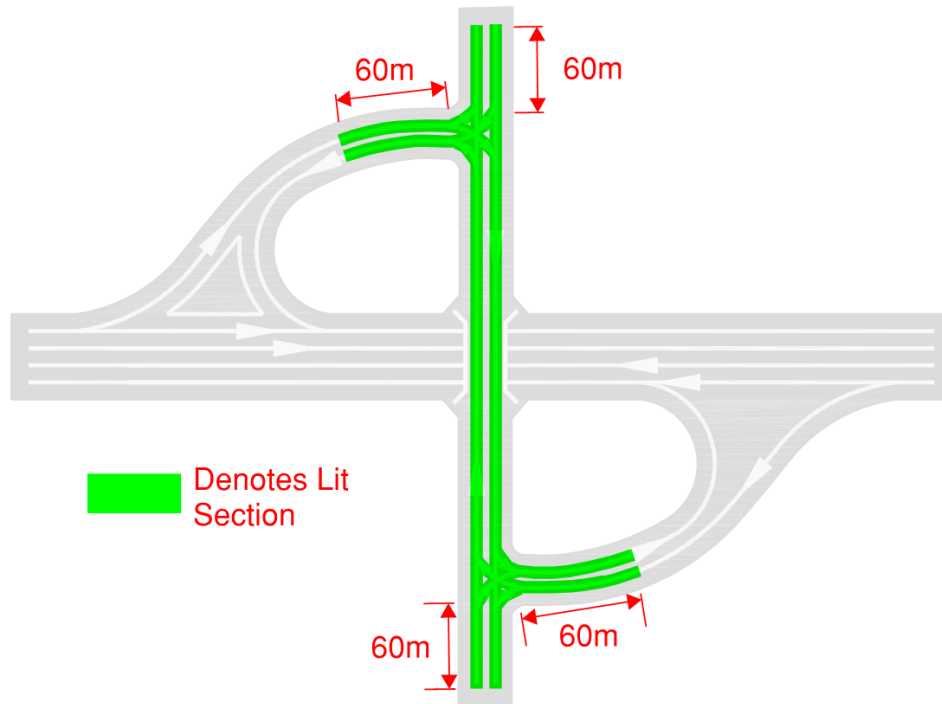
Lighting Extents for a Typical Layouts of a Half Cloverleaf Quadrant 1 and 3 Junction
